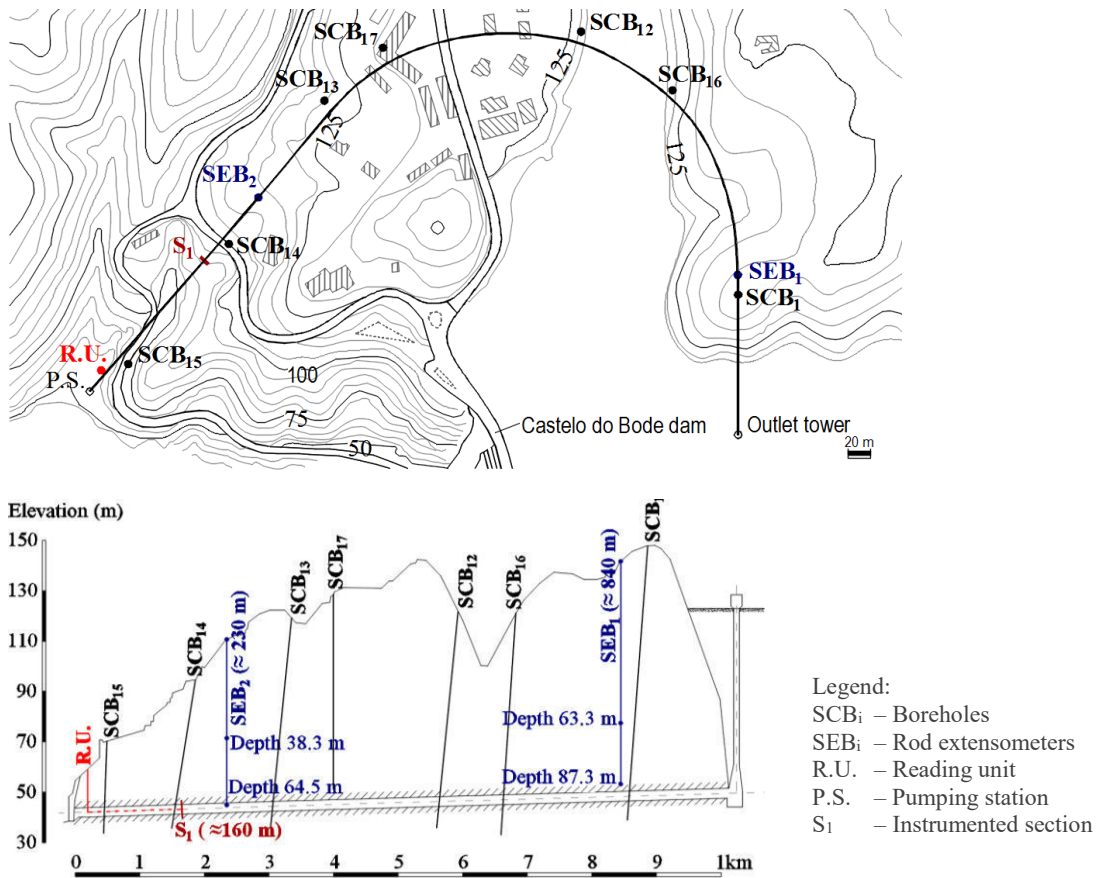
Plant (above) and longitudinal profile (below) of the hydraulic tunnel.
